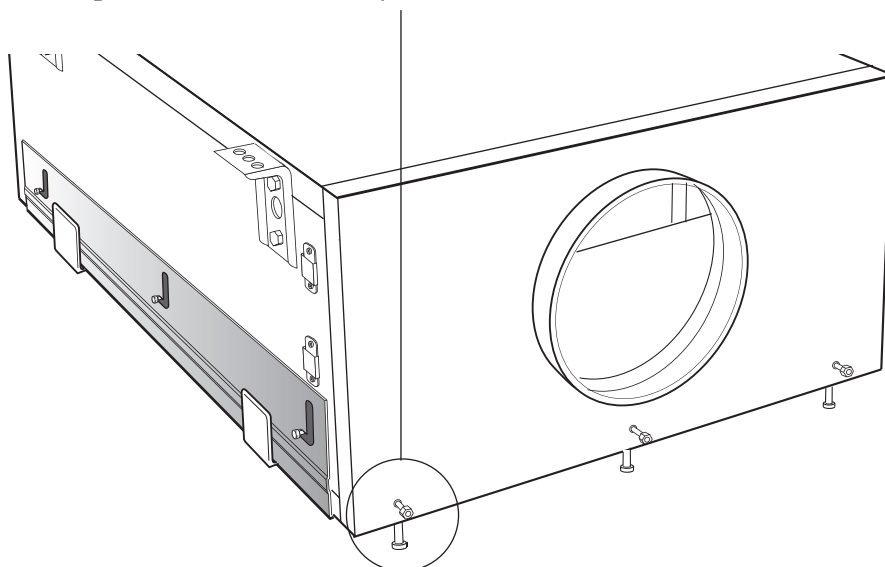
Step 7: To complete closure of the access panel and make secure, retighten 6 lower end panel fixings, 3 each end of the unit and the 6 base fixings, 3 each end of the access panel.
